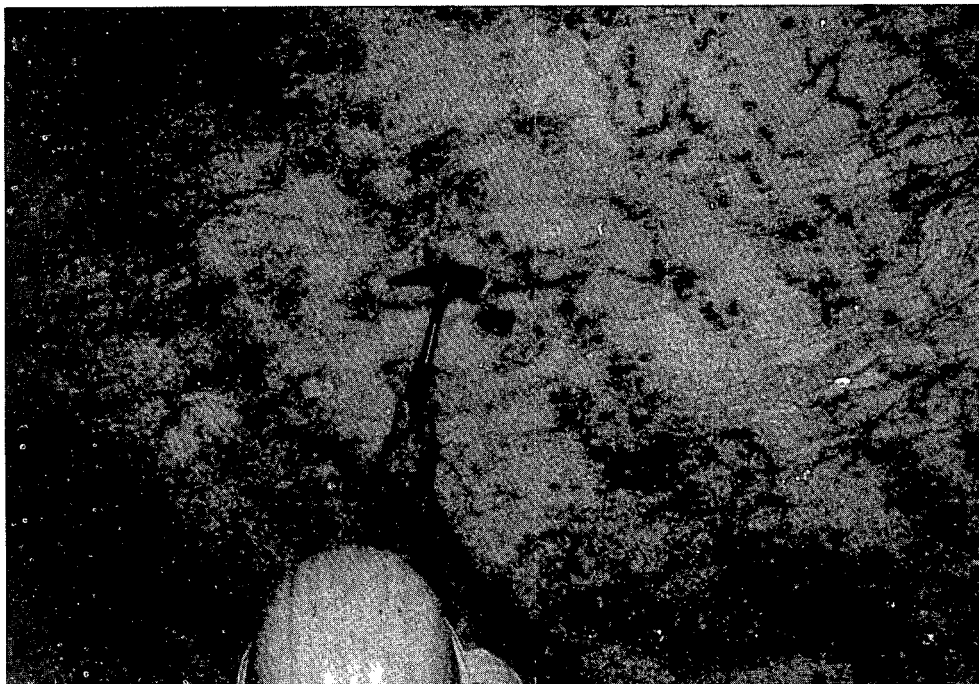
Precipitated Brine on the Northwest Wall of the East Heading
